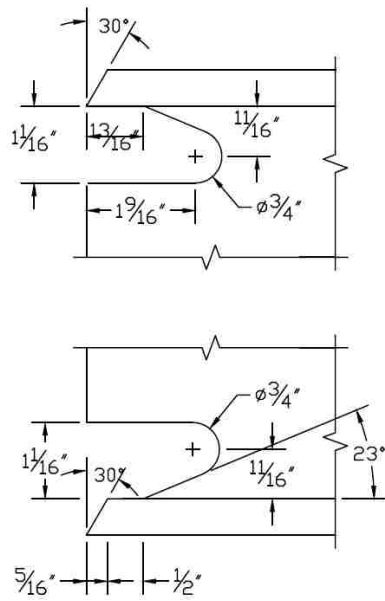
Modified Weld Access Hole Details (AISC 2005)
